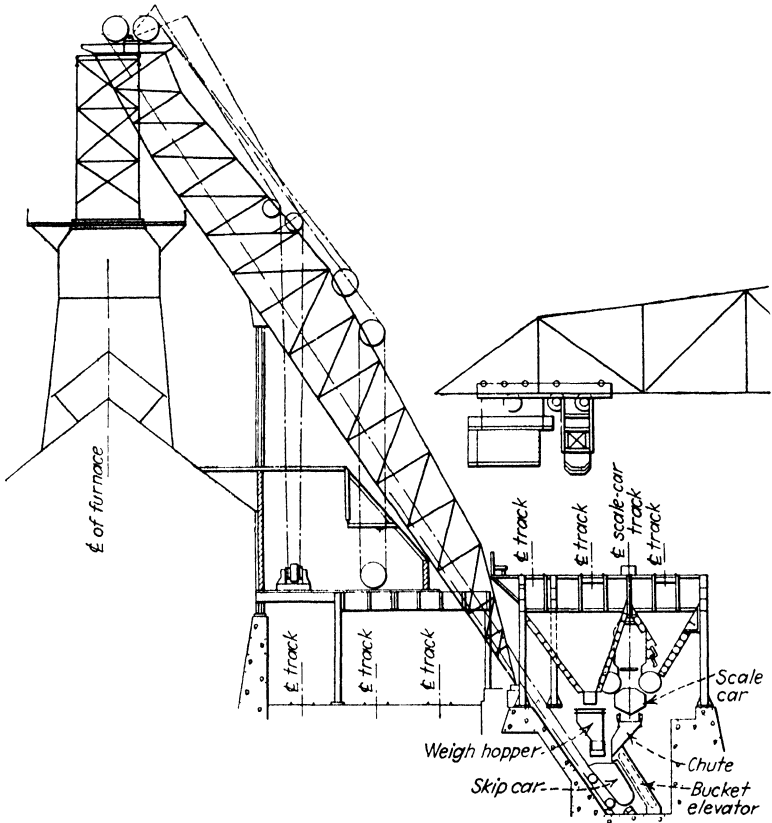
Skip hoist and stock house (Courtesy of Blast Furnace & Coke Oven Assoc., Chicago.)
